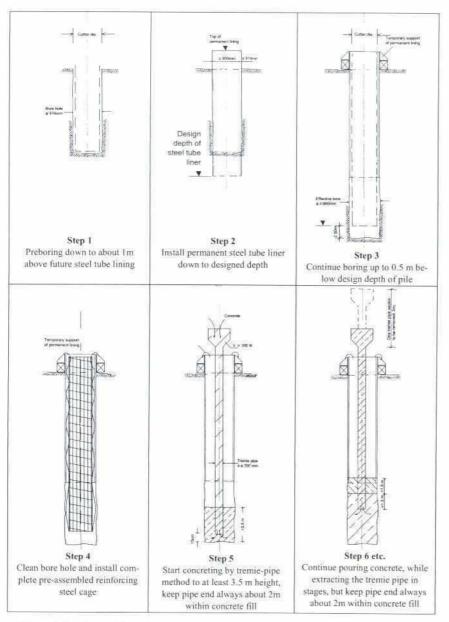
General installation method for bored in-situ cast reinforced concrete piles
